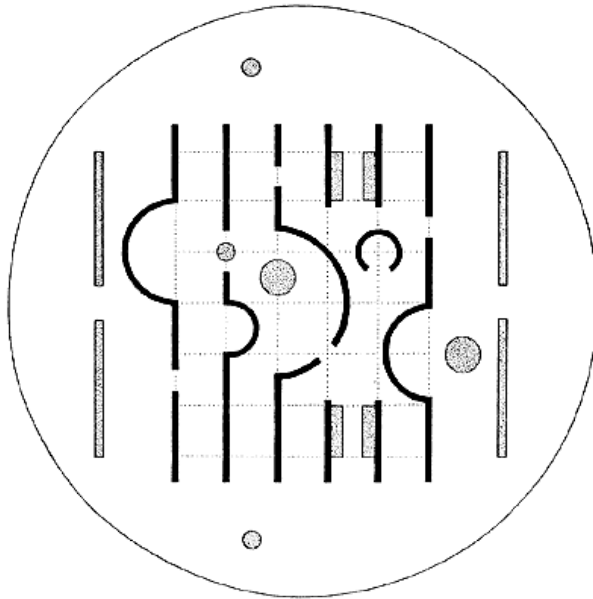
The Sonsbeek Pavilion, Arnhem, plan
